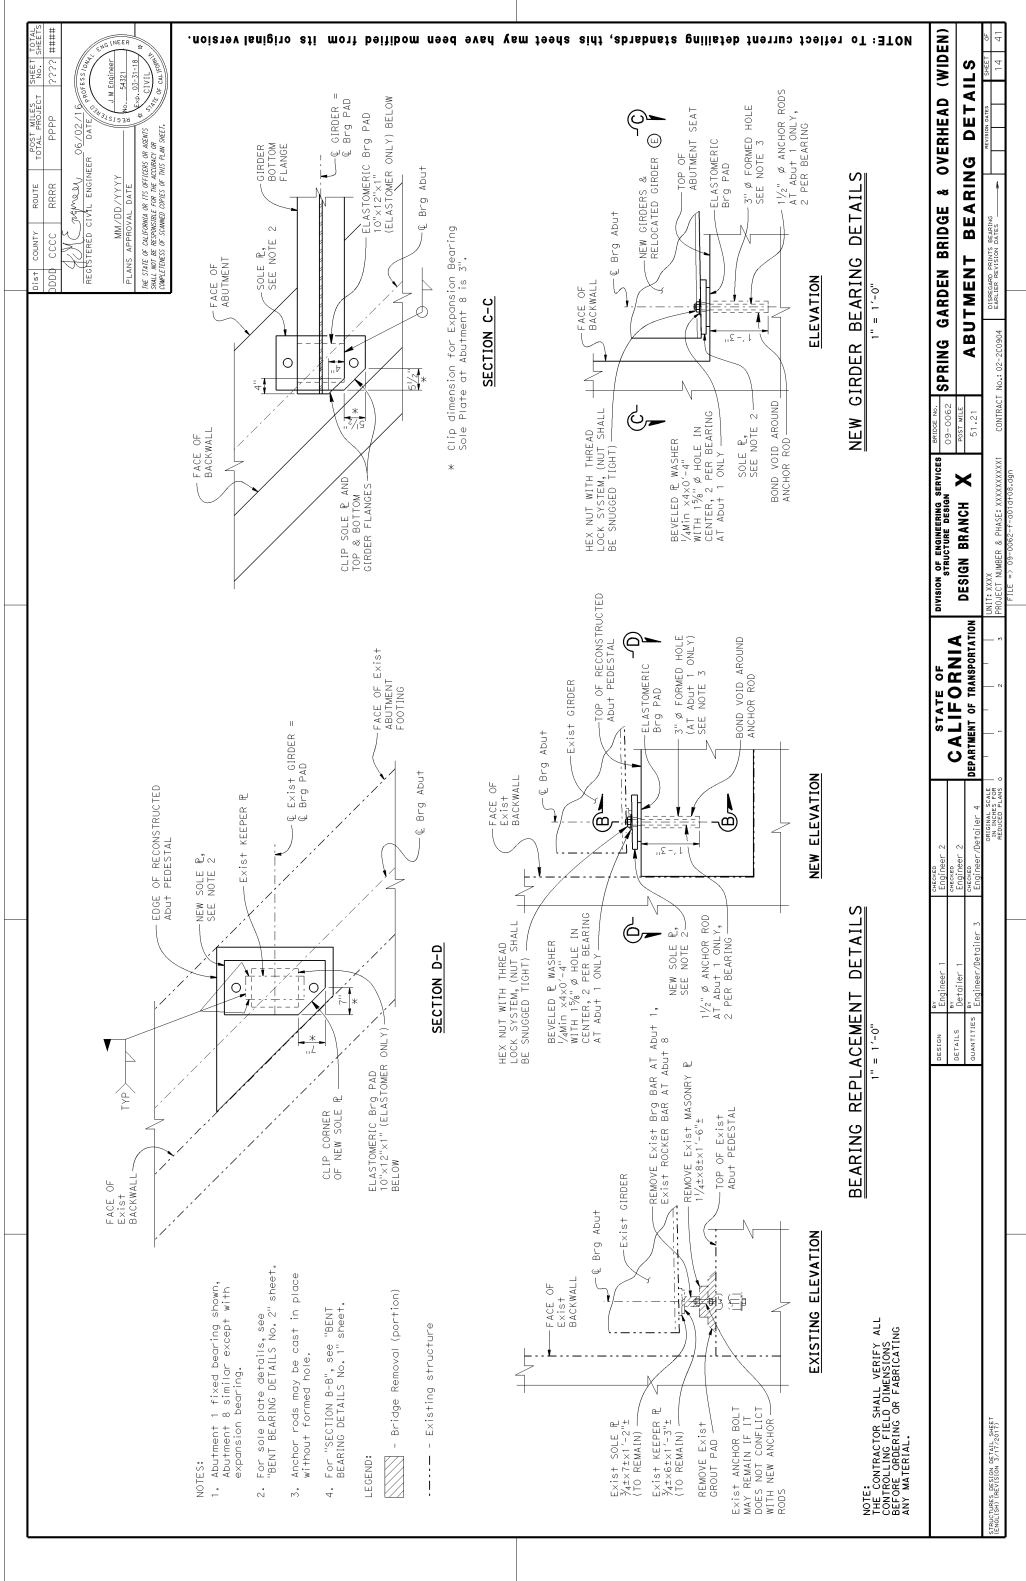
A.A.16 Steel Girder Bridge Detailing Example 16
